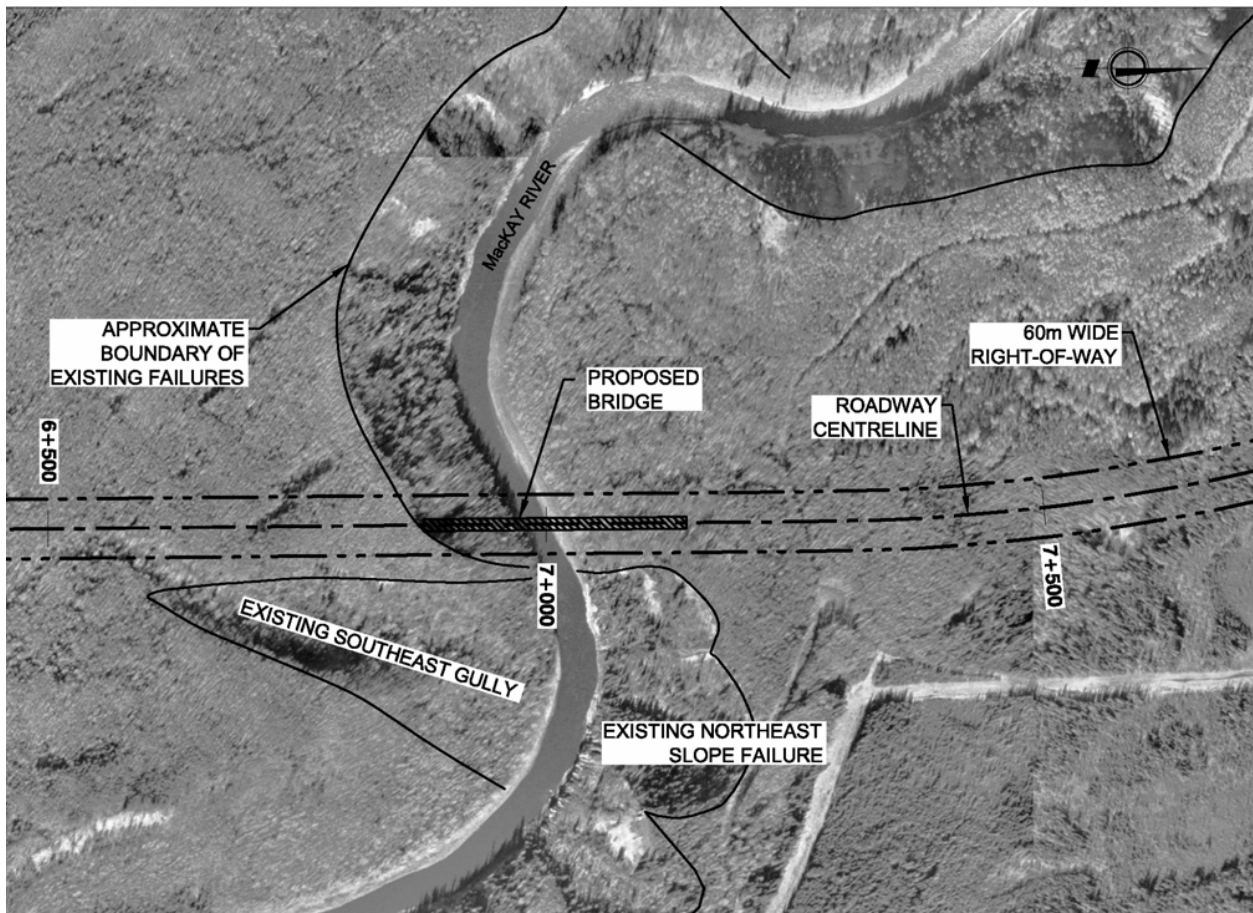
Aerial View of MacKay River Crossing Showing Nearby Slope Failures
